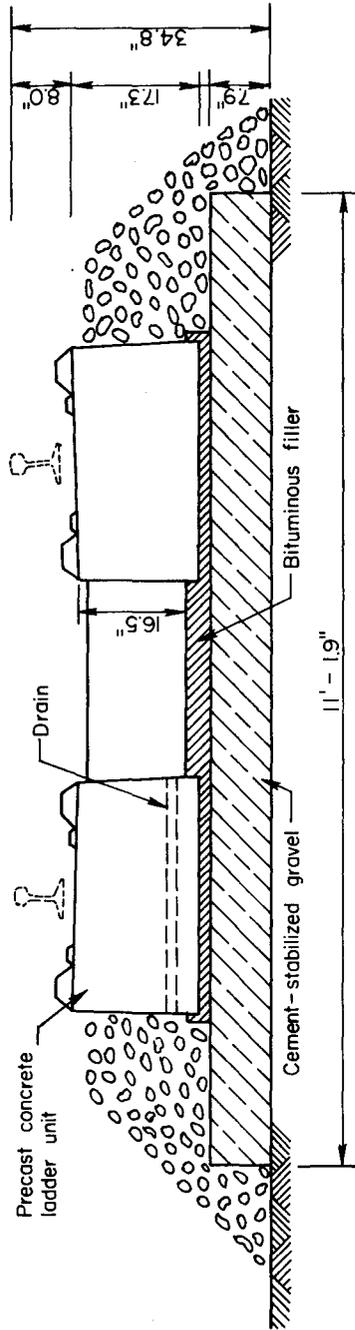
CROSS SECTION OF TRACK WITH PRECAST CONCRETE LADDER UNITS
